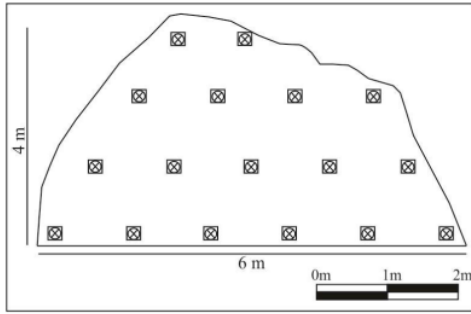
Sketch illustration Rock bolt 1 inch in diameter 3.1 feet apart on slope section 1
